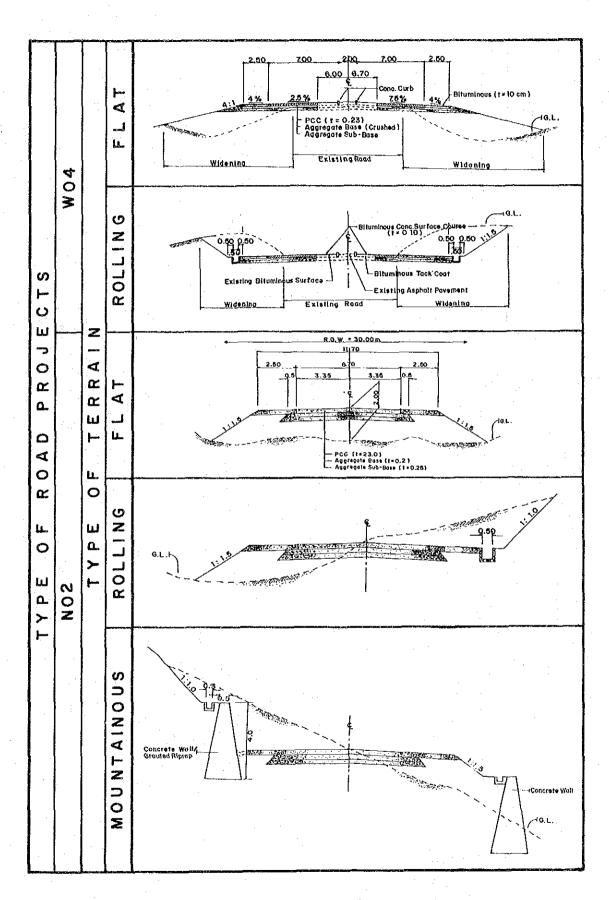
(2) TYPICAL ROAD CROSS-SECTION
